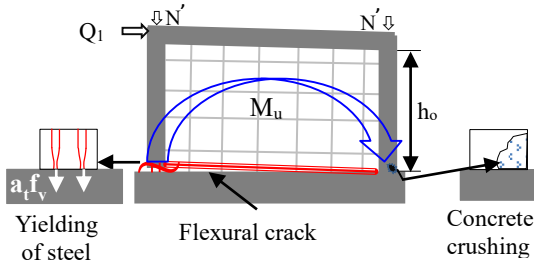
Load transfer mechanism of flexural yielding of frame (Failure I)
